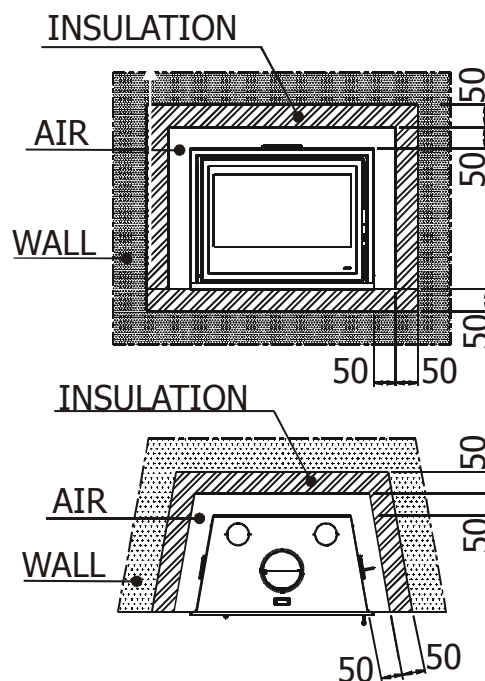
Minimum Clearance to Combustibles (Purpose Built Structure)
